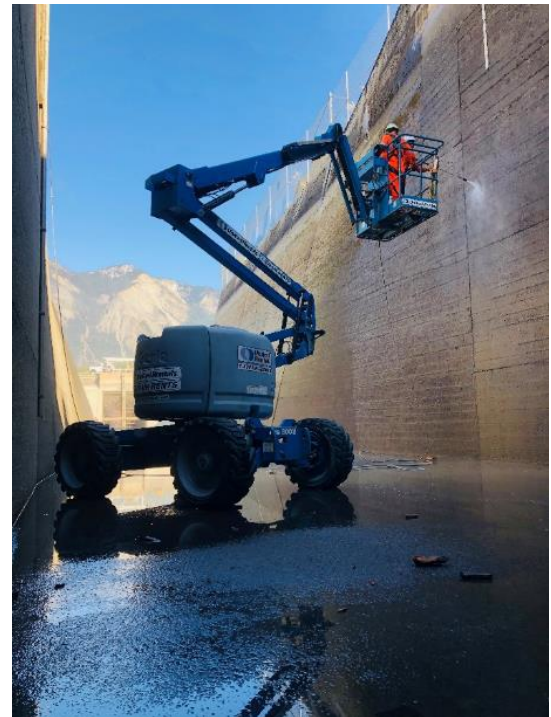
Cleaning the Seton Canal forebay concrete liner prior to inspection.
